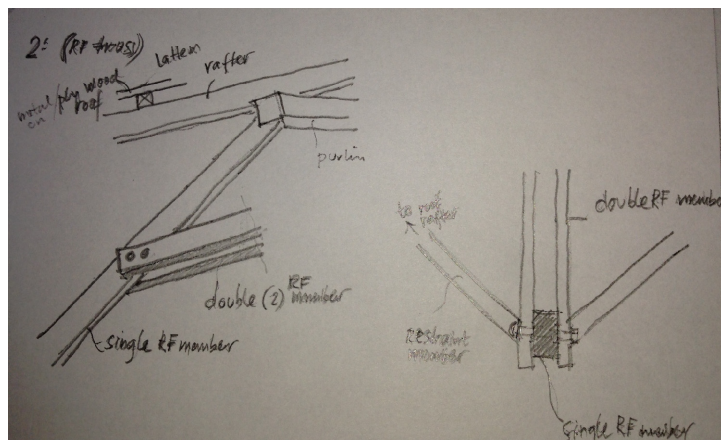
Alternating “one” and “two-rafters” for the structural members simplifies the connections and gives an enhanced aesthetic simplicity.
